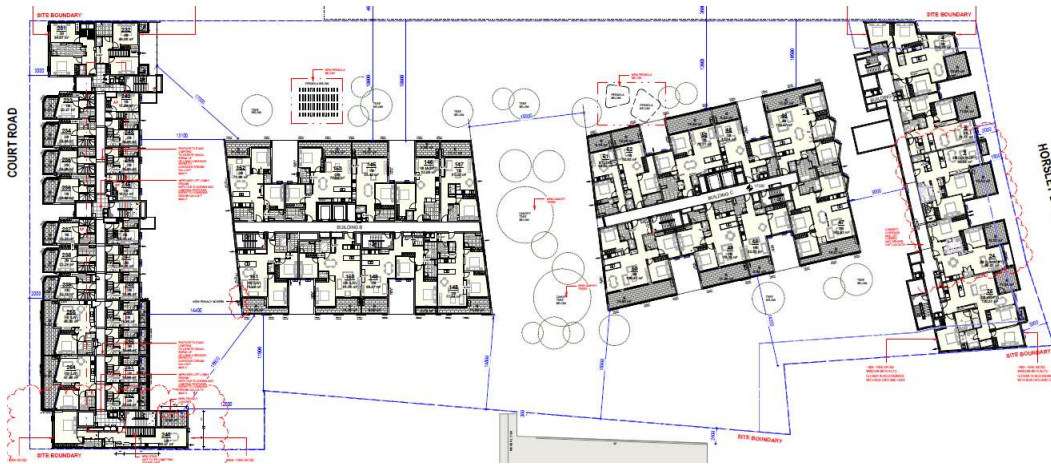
Proposed Level 1 plan alterations consisting of improvements to the corridors of approval levels plus detailing of fire safety measures. Similar improvements proposed for other levels.
